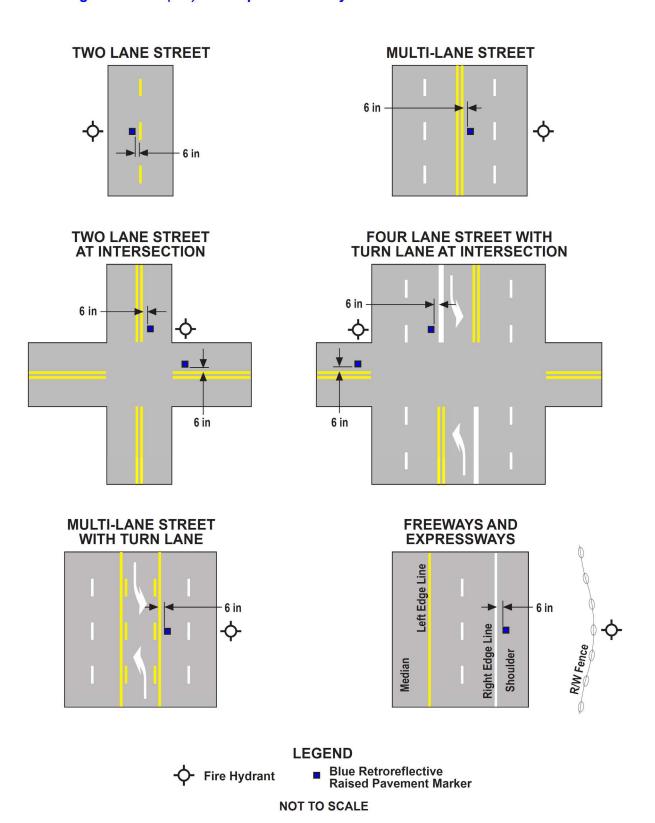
B-102 (CA). Examples of Fire Hydrant Location Pavement Markers
